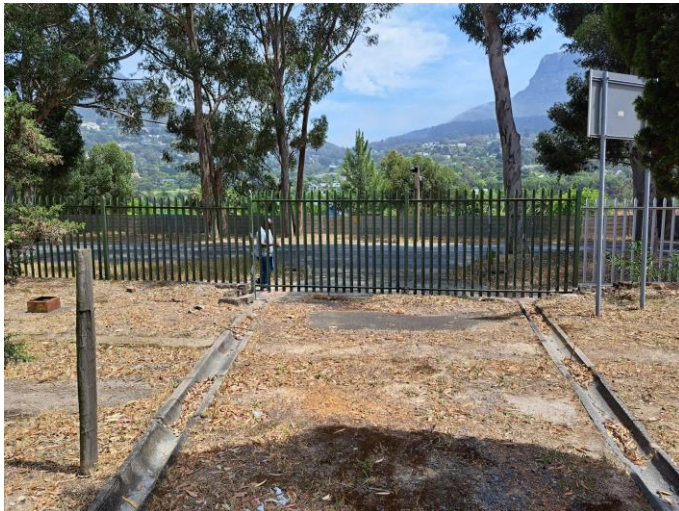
Closed off access to the site ERF 1462 along Hout Bay Main Road
